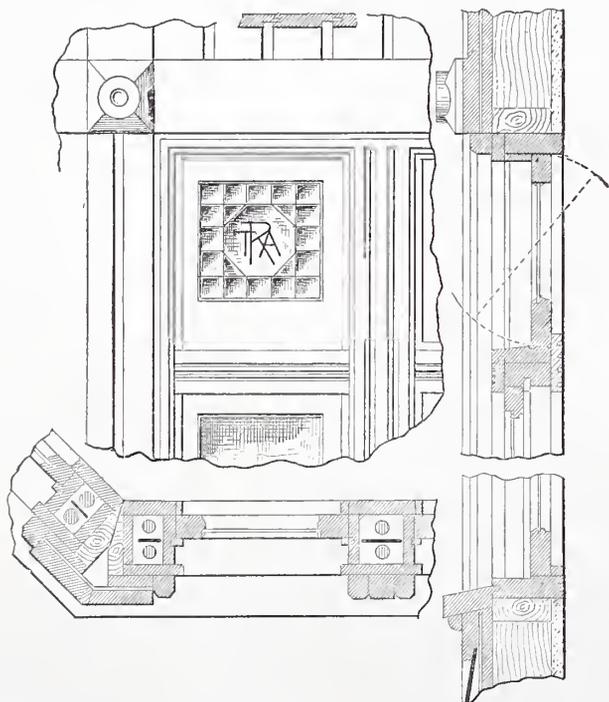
Plan and Section of Bay Window with Detail of Stained Glass in the Upper Part.—Scale, 3/8 Inch to the Foot.
